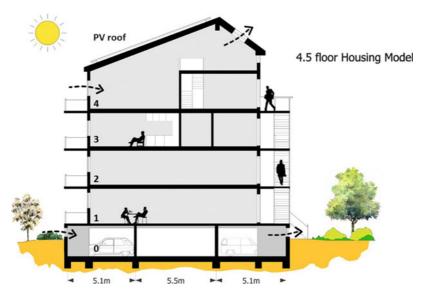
Section through a typical low-rise typology of 4–6 floors (Source: The Authors)
